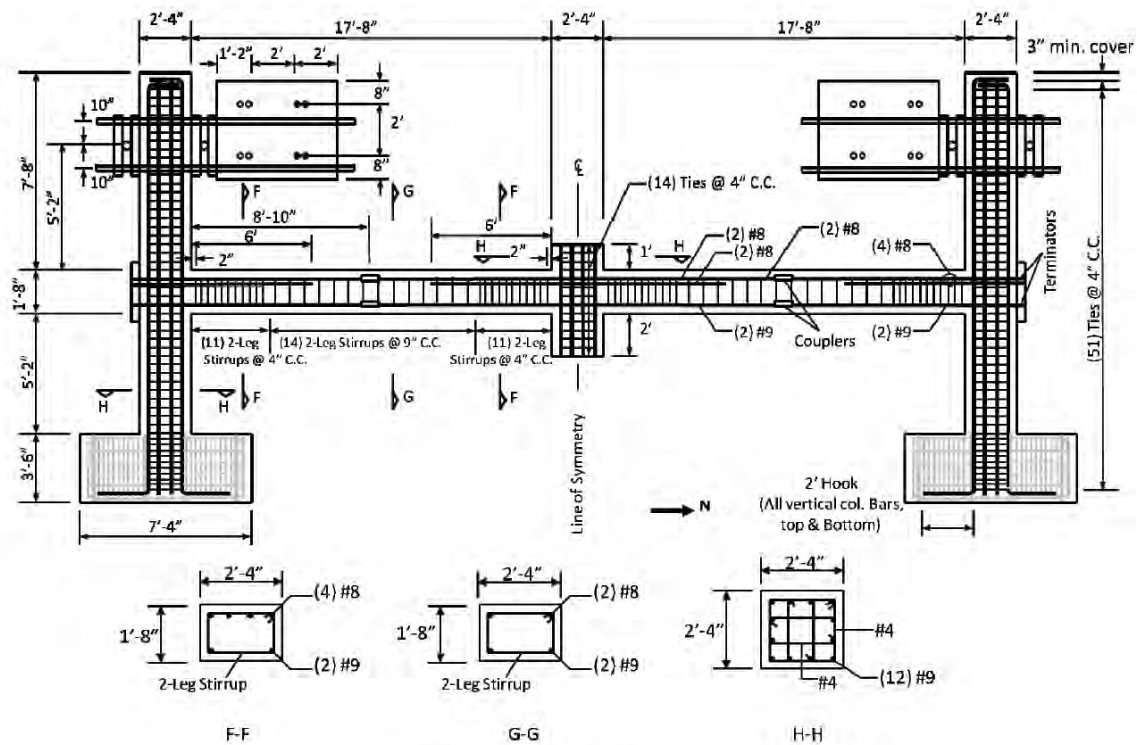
Typical Intermediate Moment Frame (IMF) Connection [Ref. 1]
